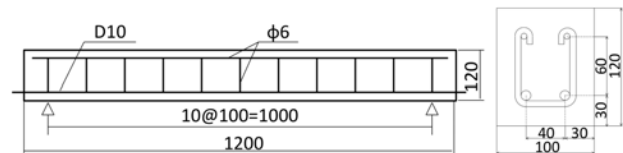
Reinforcement arrangement of RC beam (unit: mm)
